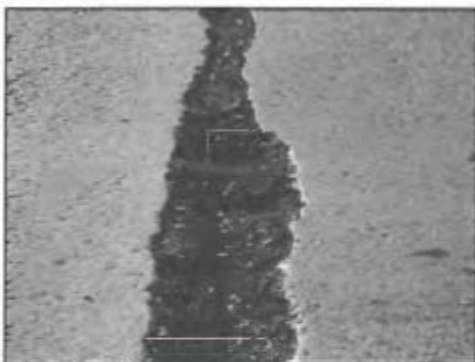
Deep Spalls in the Deck Adjacent to the Joint Seal at Pier 3
